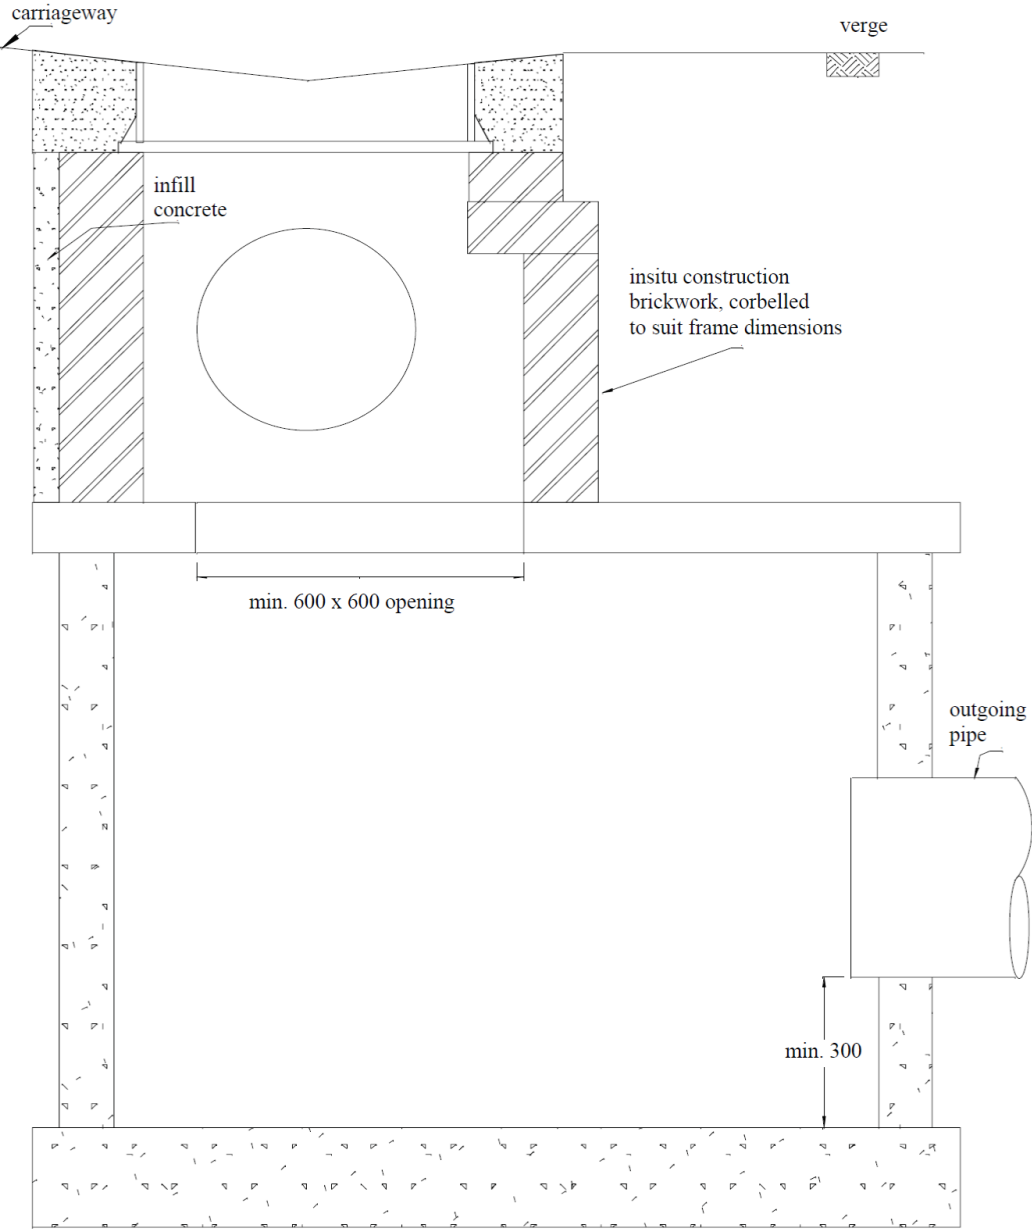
Example of combined channel and pipe terminal outlet - transverse cross section (dimensions in mm)
